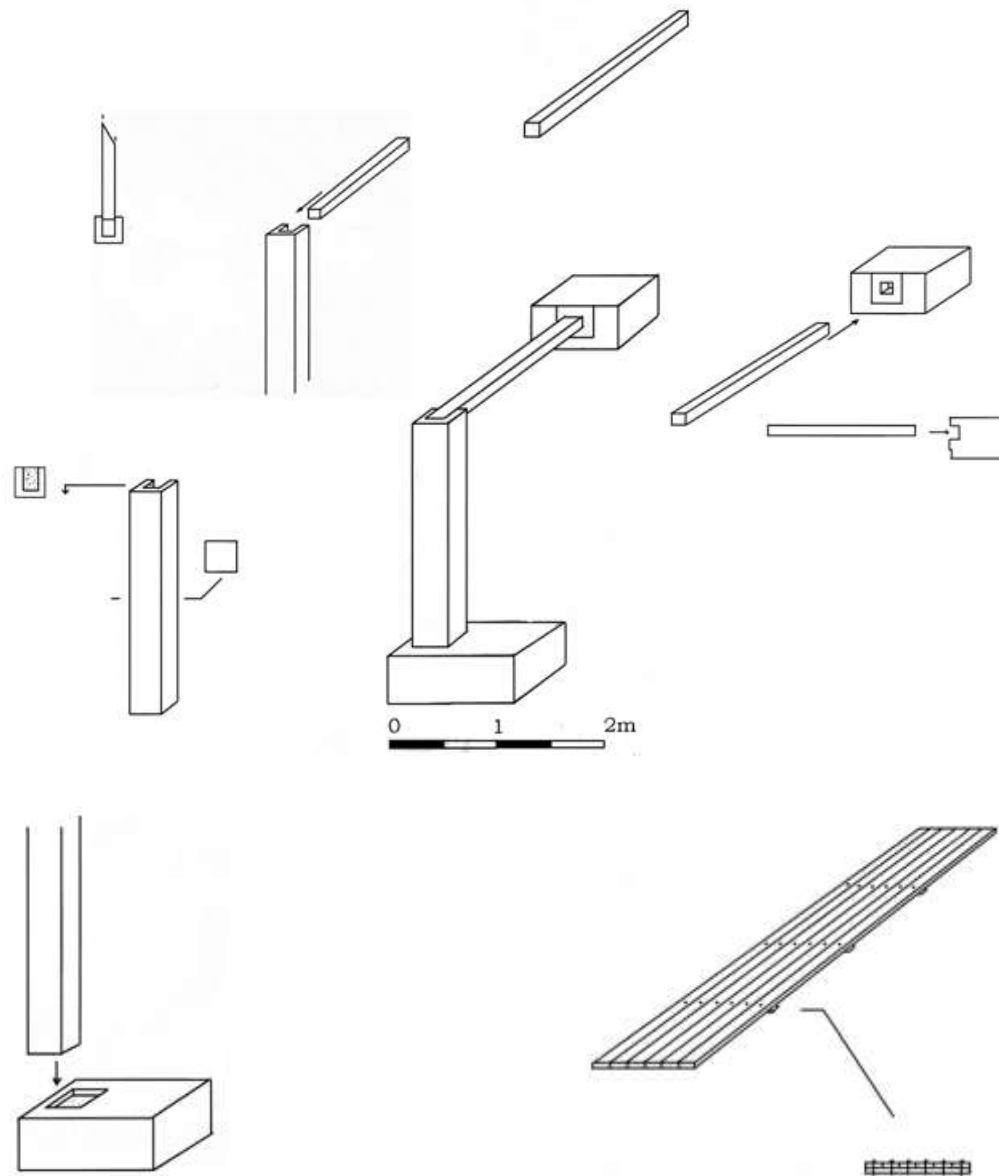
Missing strap walls in the east wall, see Fig. 5.28, replaced by stone footing, wooden upright, joist socketed in a block from the outer wall; removable wallwalk consists of six planks, *bottom right
